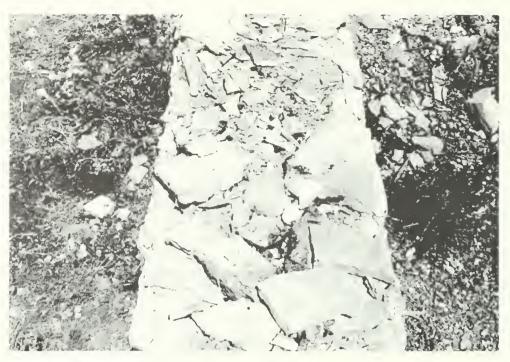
Condition of ruined Sherrick Barn foundation prior to stabilization. Note failure of limestone when exposed to extreme heat.
